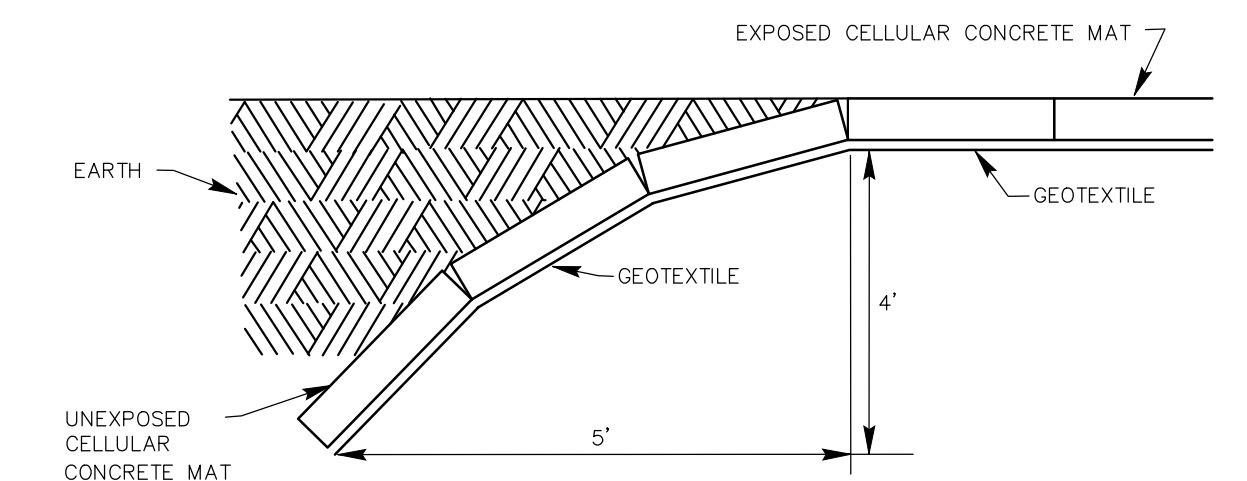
DETAIL - STANDARD SLOPE (4:1 SLOPE)
